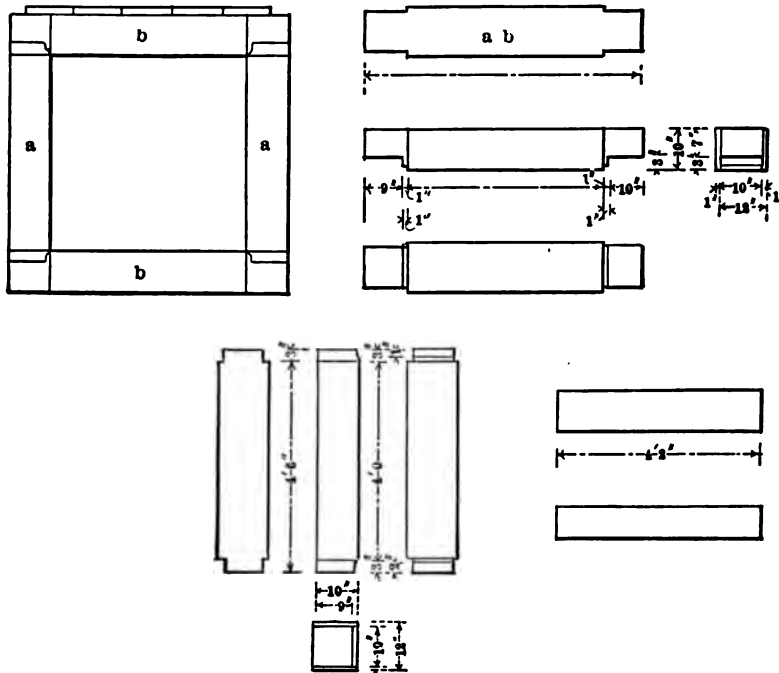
DETAILS OF THE FOUR-PIECE SET.
